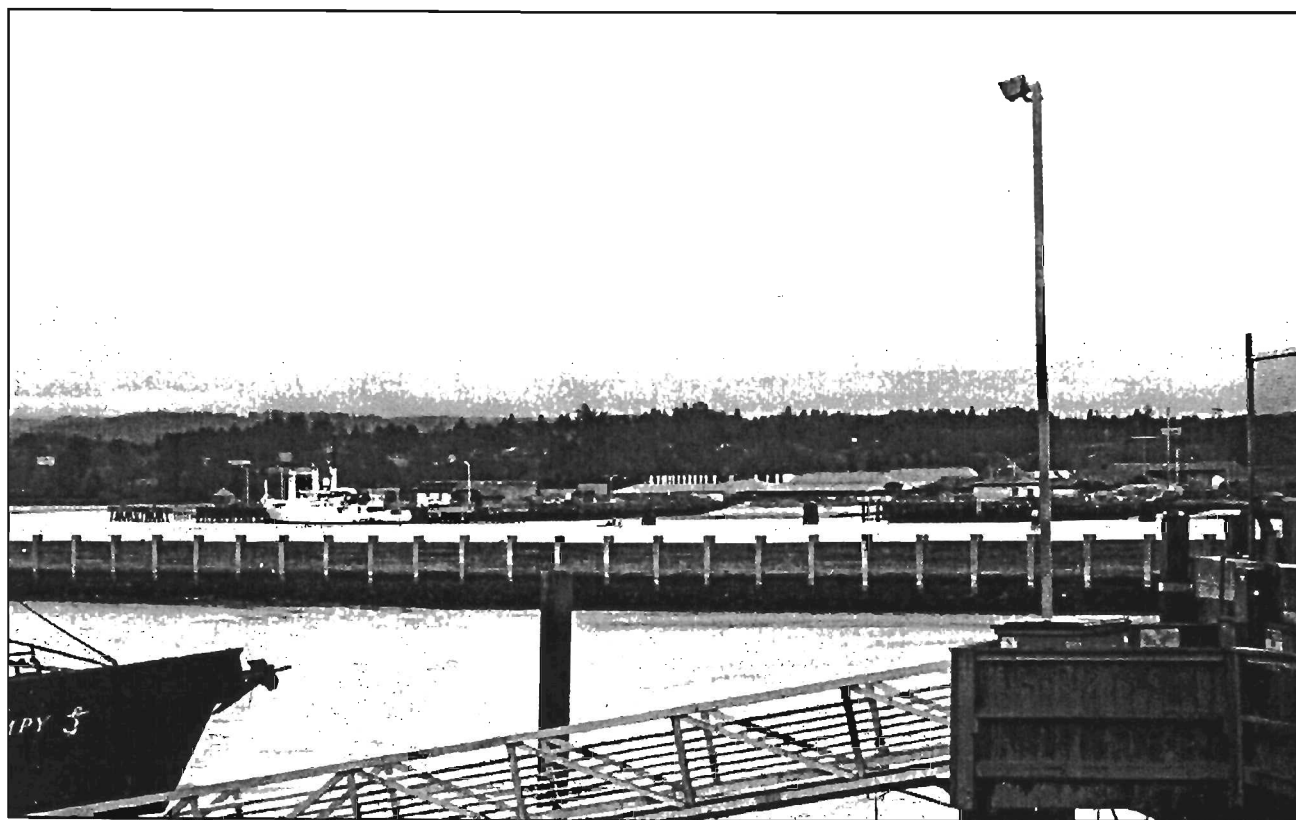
View of site from sidewalk along Yaquina Bay Road looking in SE direction.
